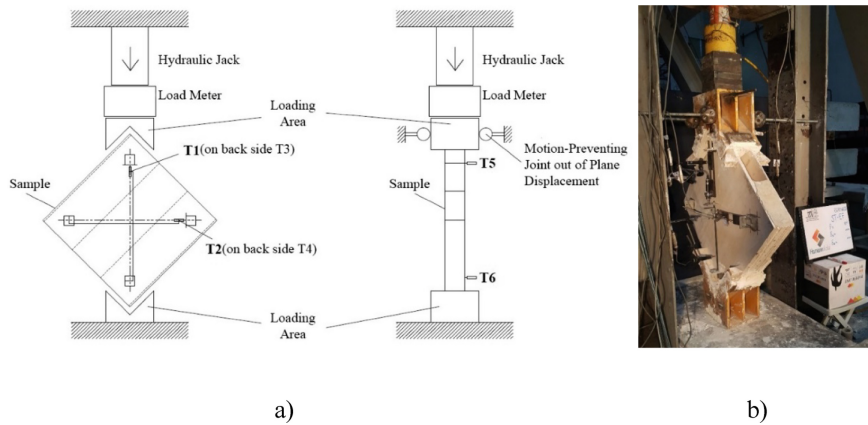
a) General view of test set-up for specimens, b) Overall view from the specimen prior to testing.
